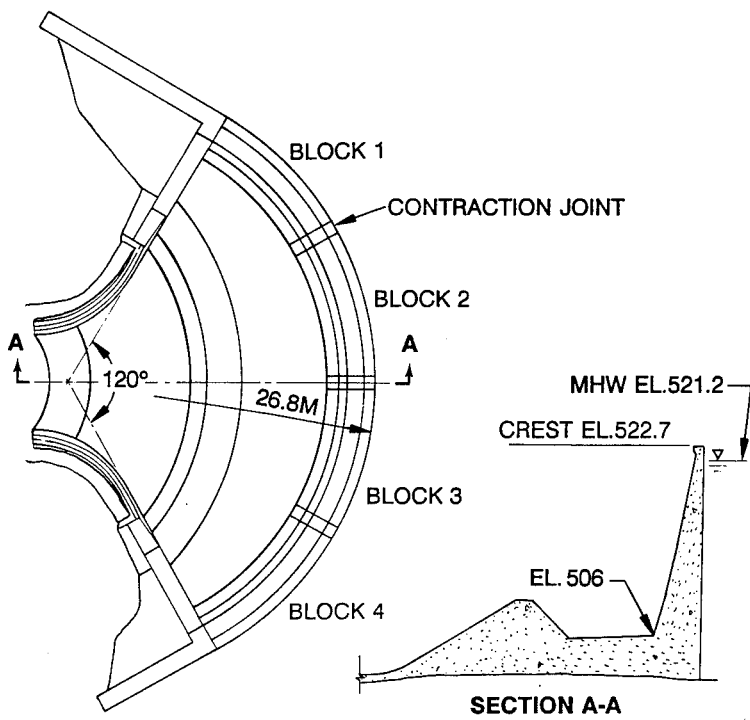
Plan and Section of Fontana Dam Emergency Spillway.
